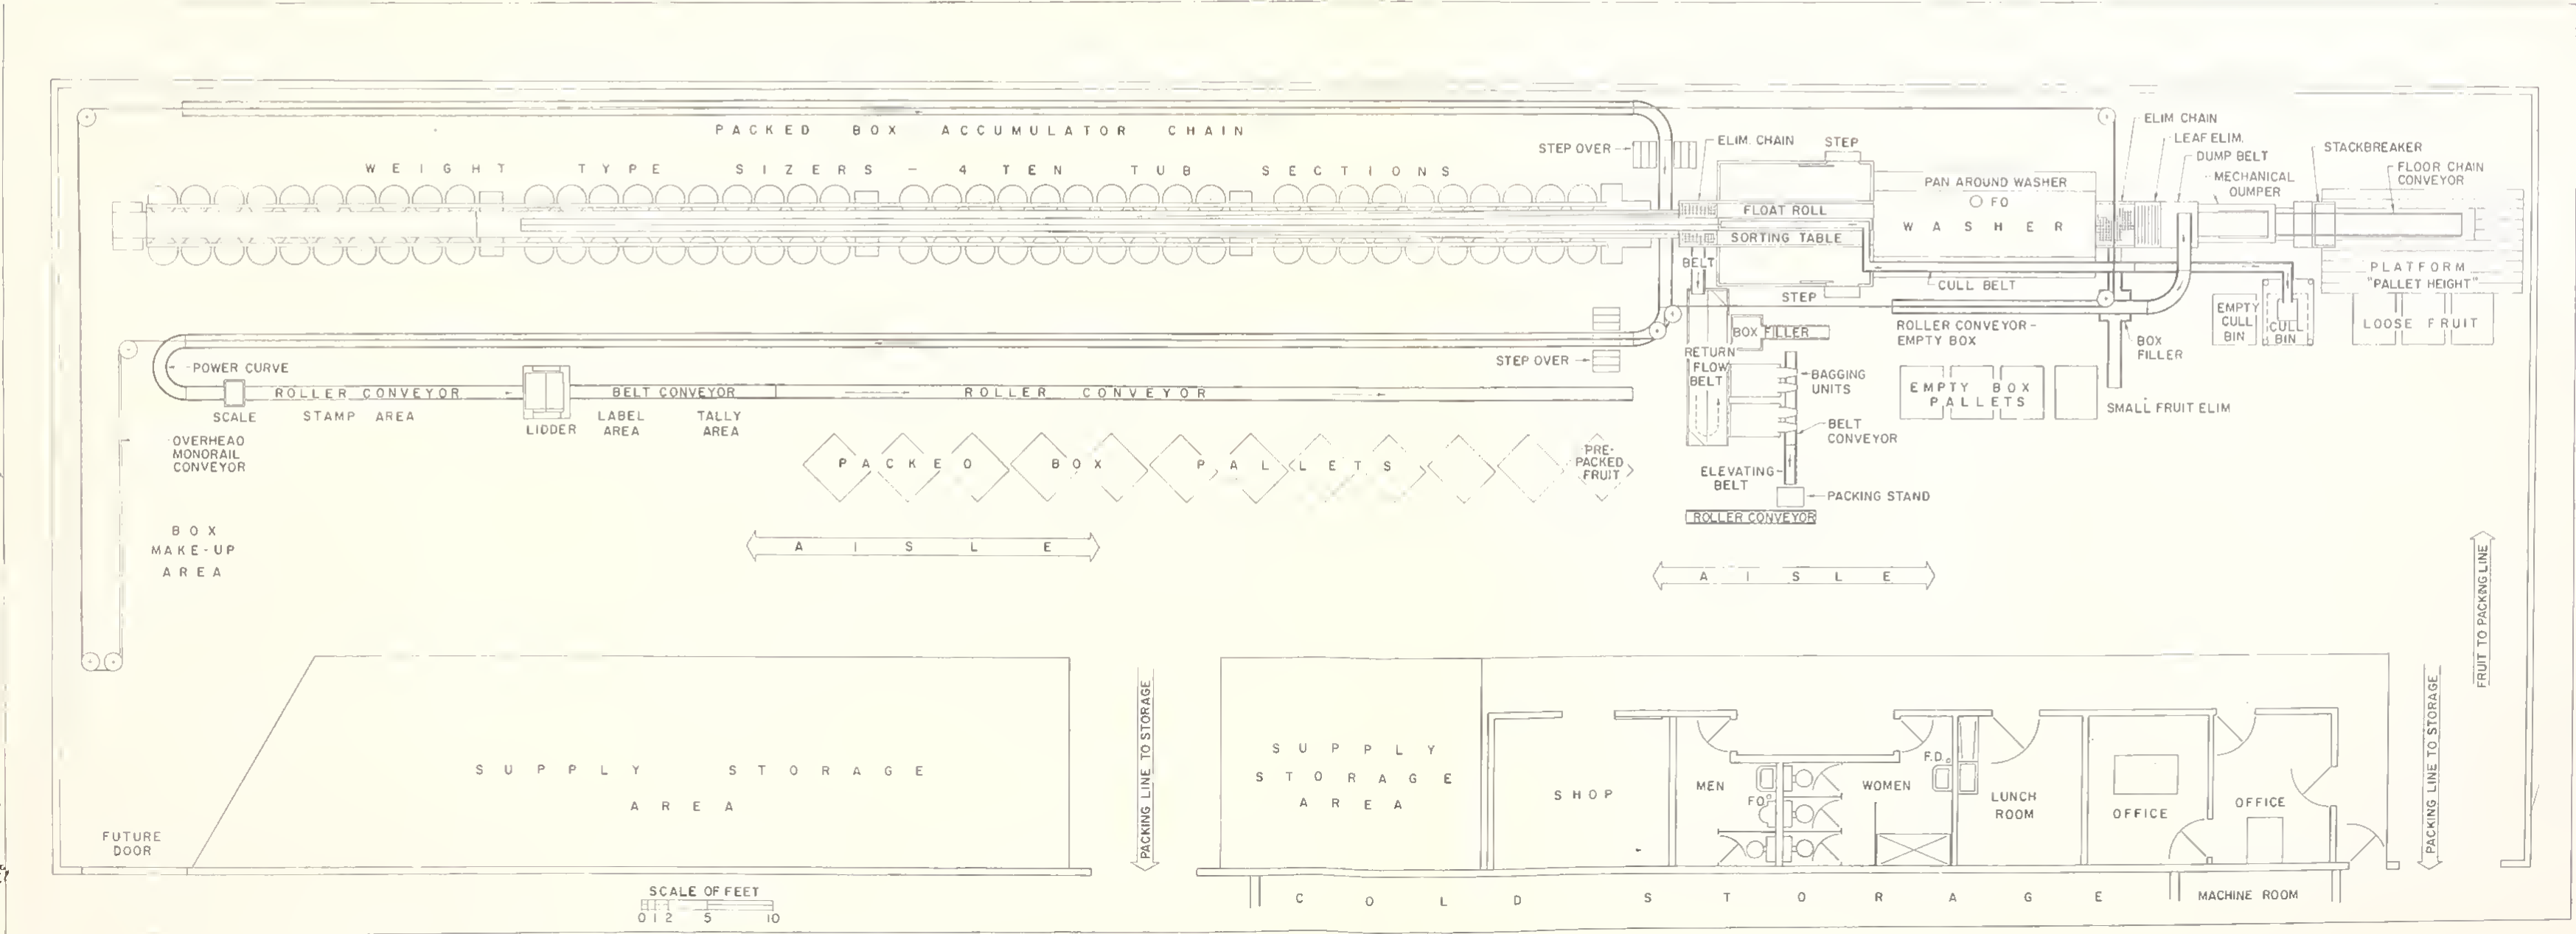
Layout of a single-line packing room for exact sizing.
